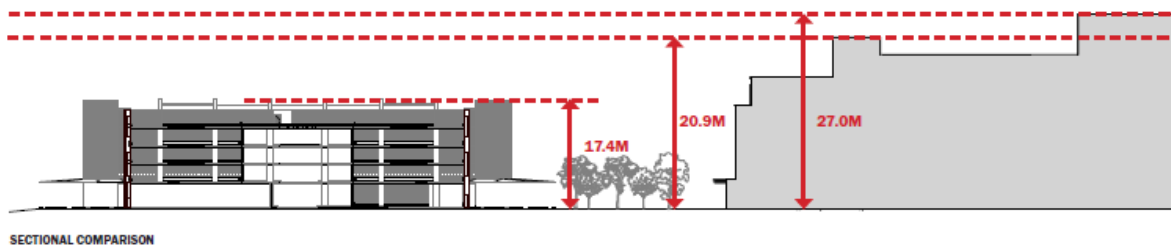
Cross-section drawing showing the height of the proposed carpark (left) against the John Gorton Building (right). (Source: BVN, Design Report December 2021 p 12).
